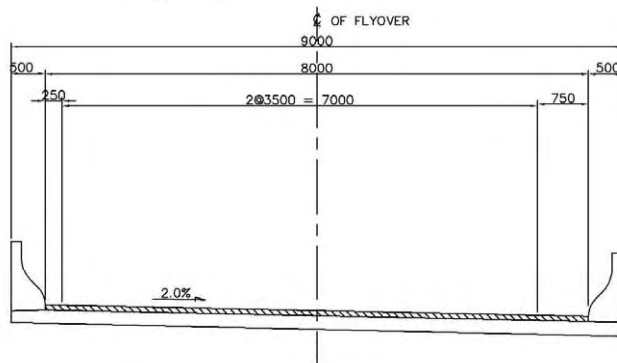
(3/3) TYPICAL CROSS SECTION OF FLYOVER
